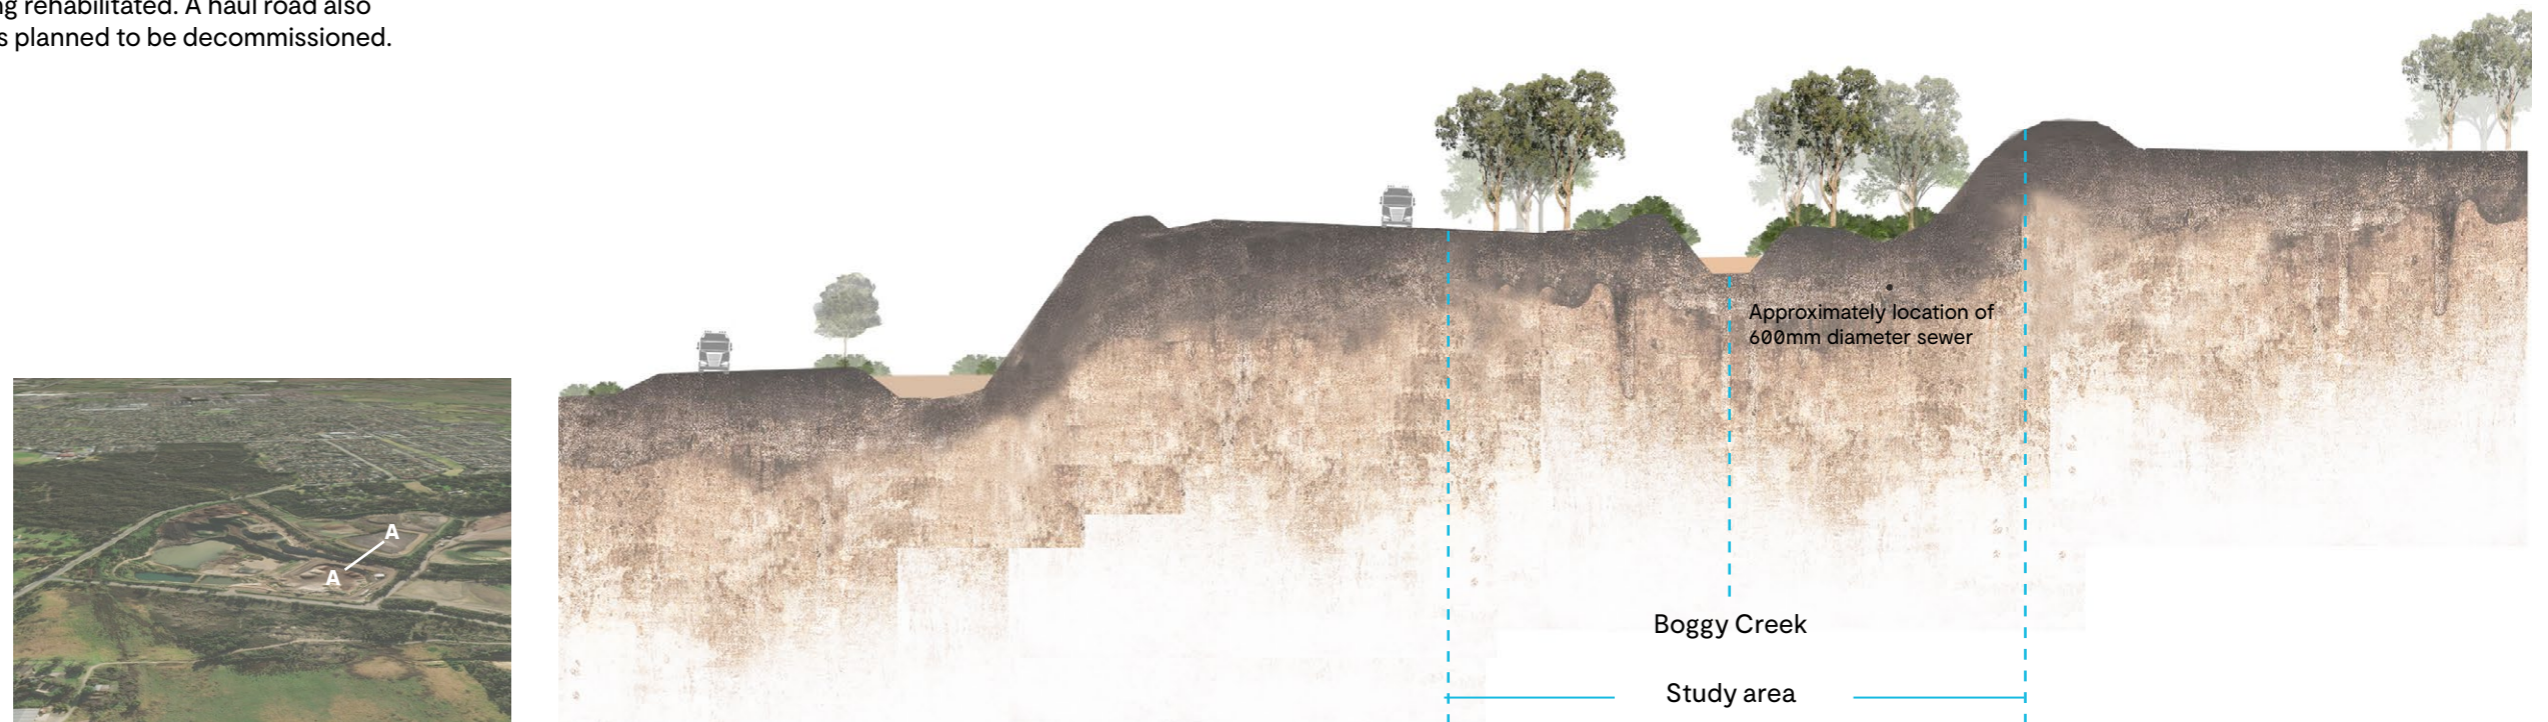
Langwarrin Quarry cross section AA index plan and existing section
